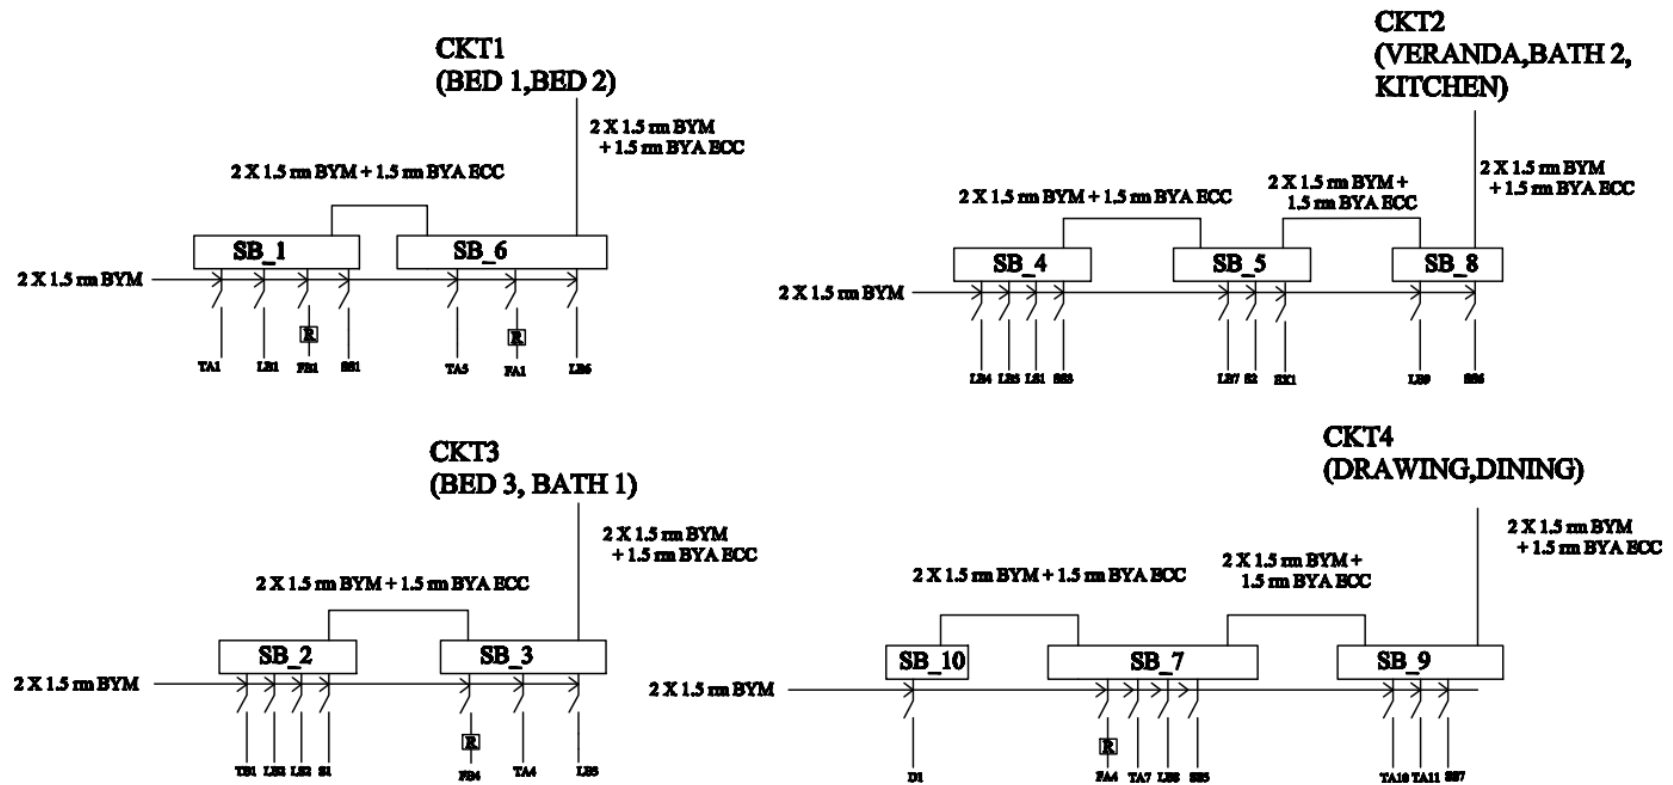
Switch Board Connection Diagram (Per Unit General Floor)
